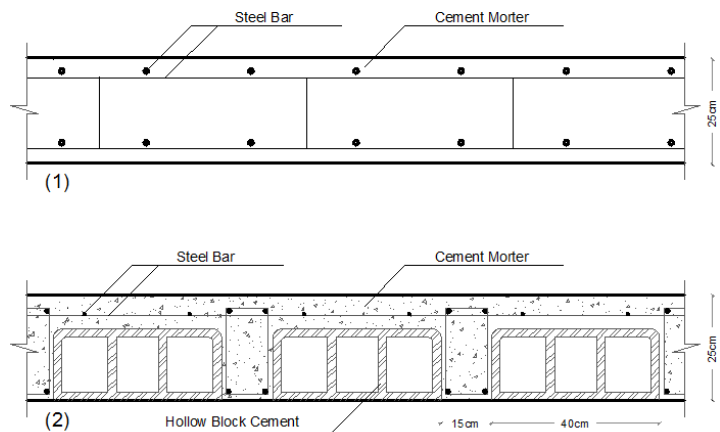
1. section in a solid slab, 2. section in ribbed slab (Ardda, 2014).
